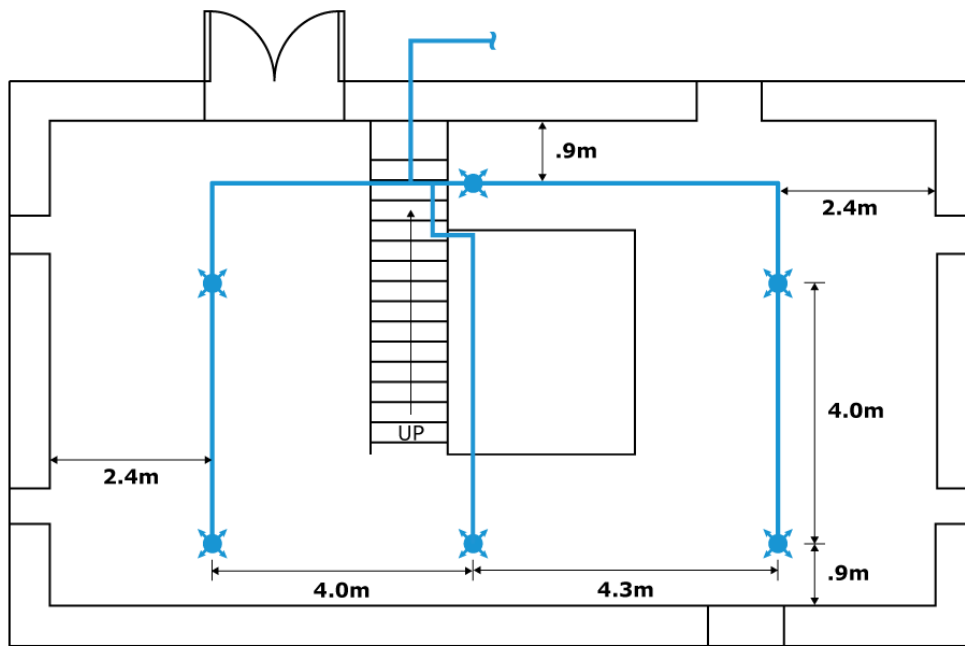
Floor plan indicating the location of the sprinkler heads and piping network installed for the experiment.
